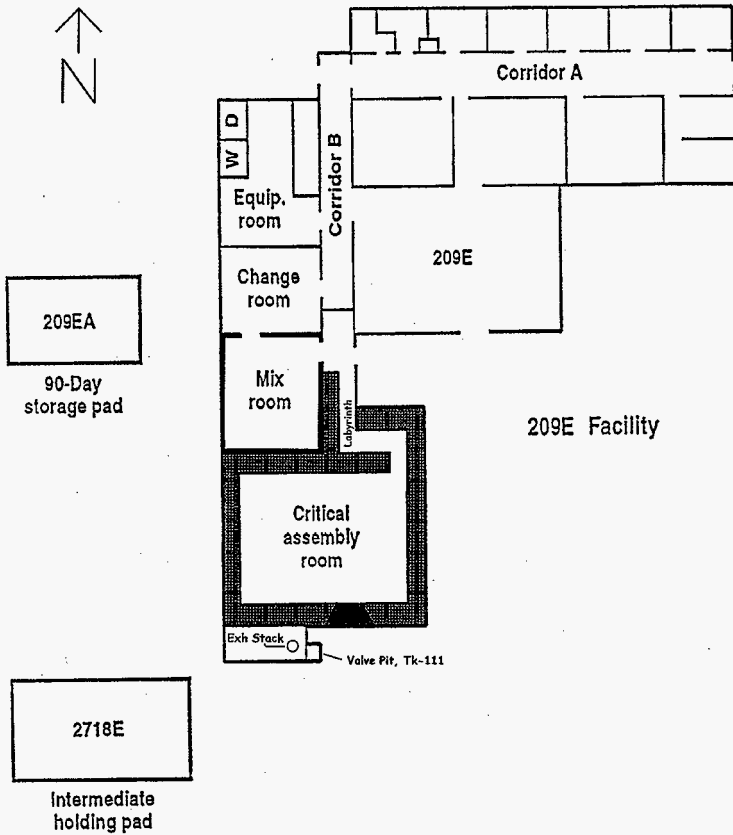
Critical Mass Laboratory, 209E Facility, Facility Layout
